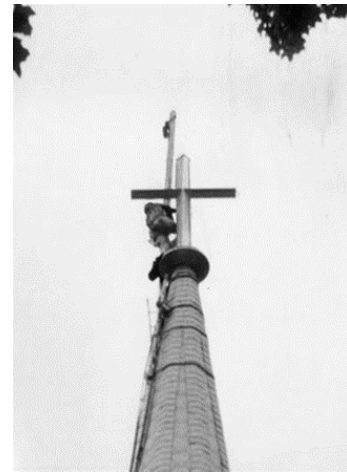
New Hamburg steeplejack Michael Creane secures ten-foot-high gold cross in place atop the First Baptist Church steeple, c. 1961 (EHS 04768)
